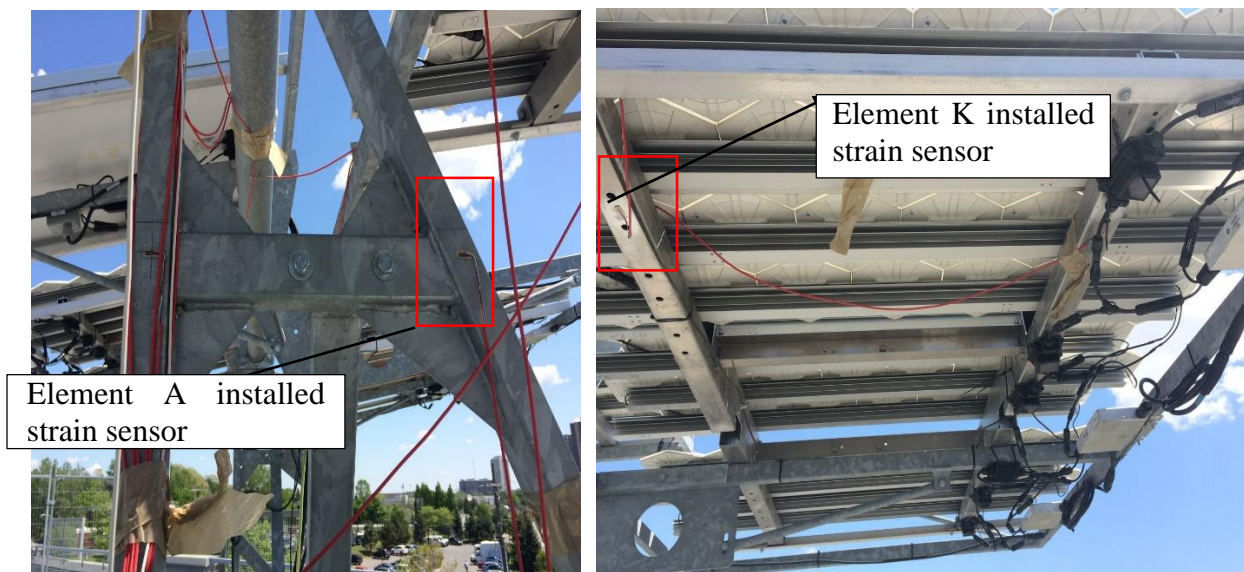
Installed strain gauge on a) Element A, and b) Element K
